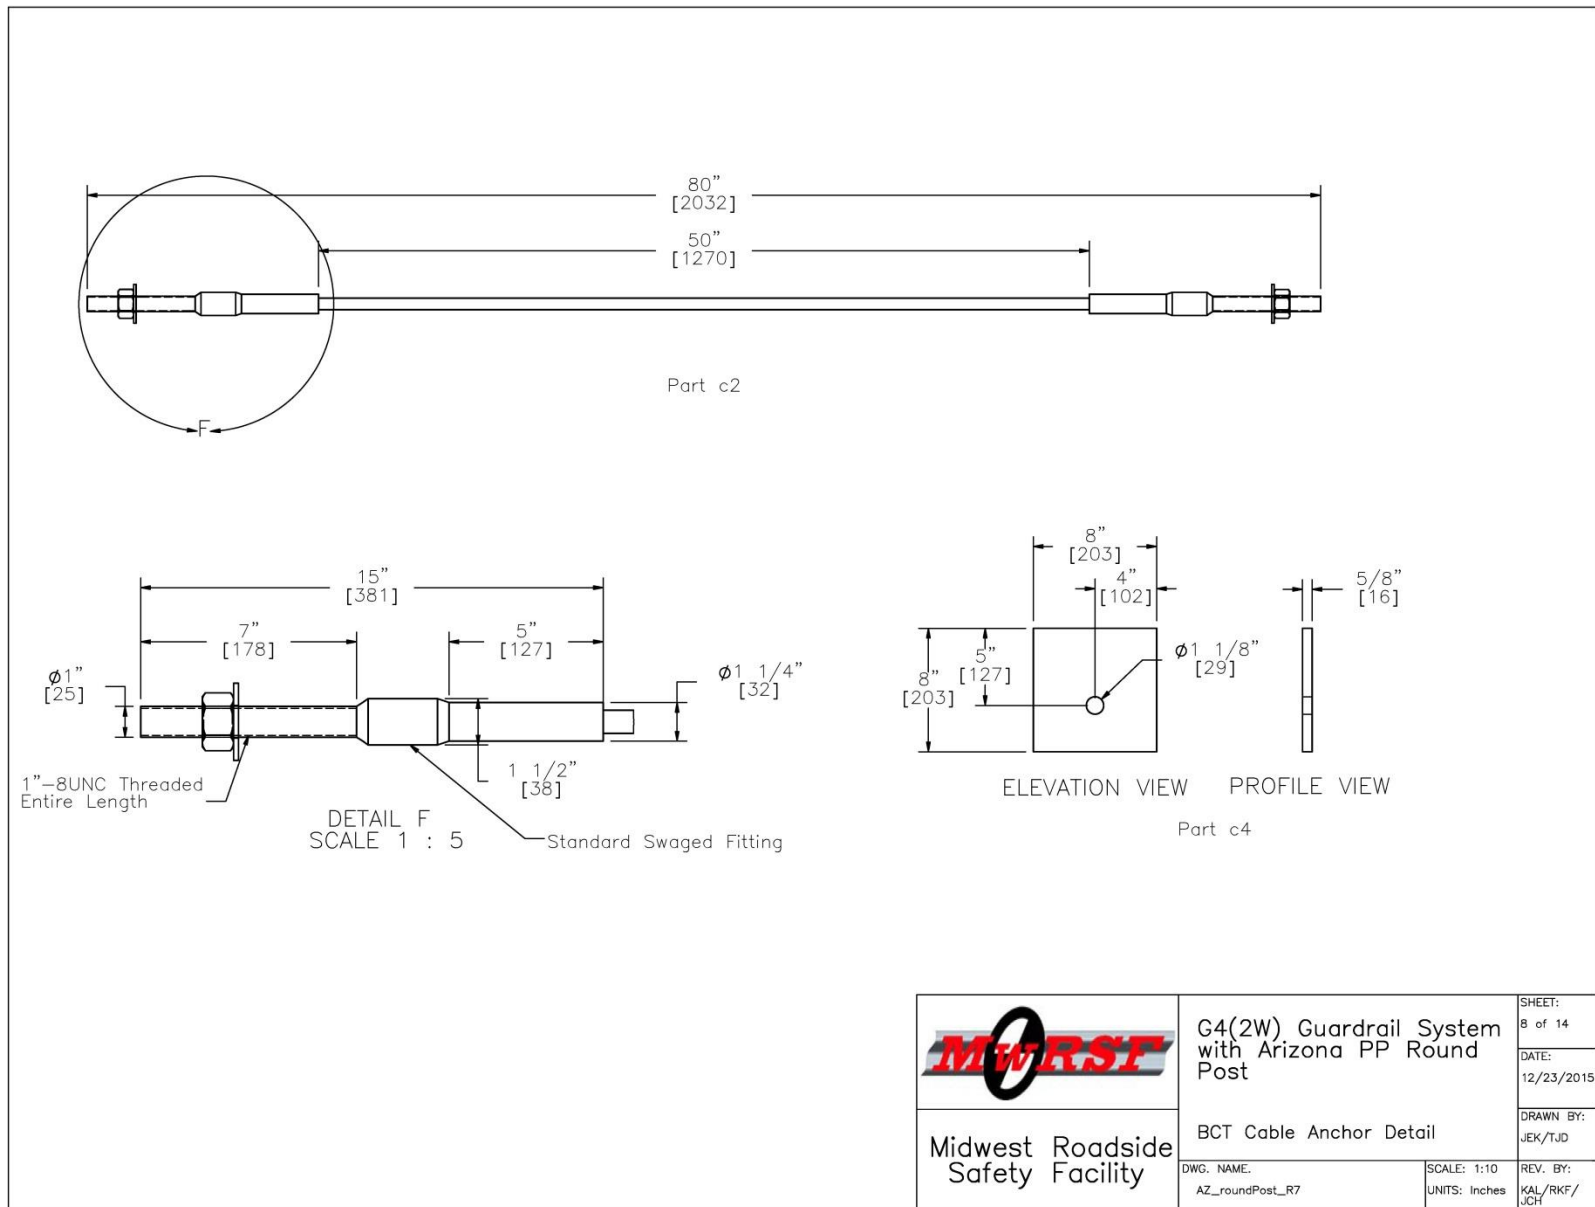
BCT Cable Anchor Details, Test No. AZRP-1
